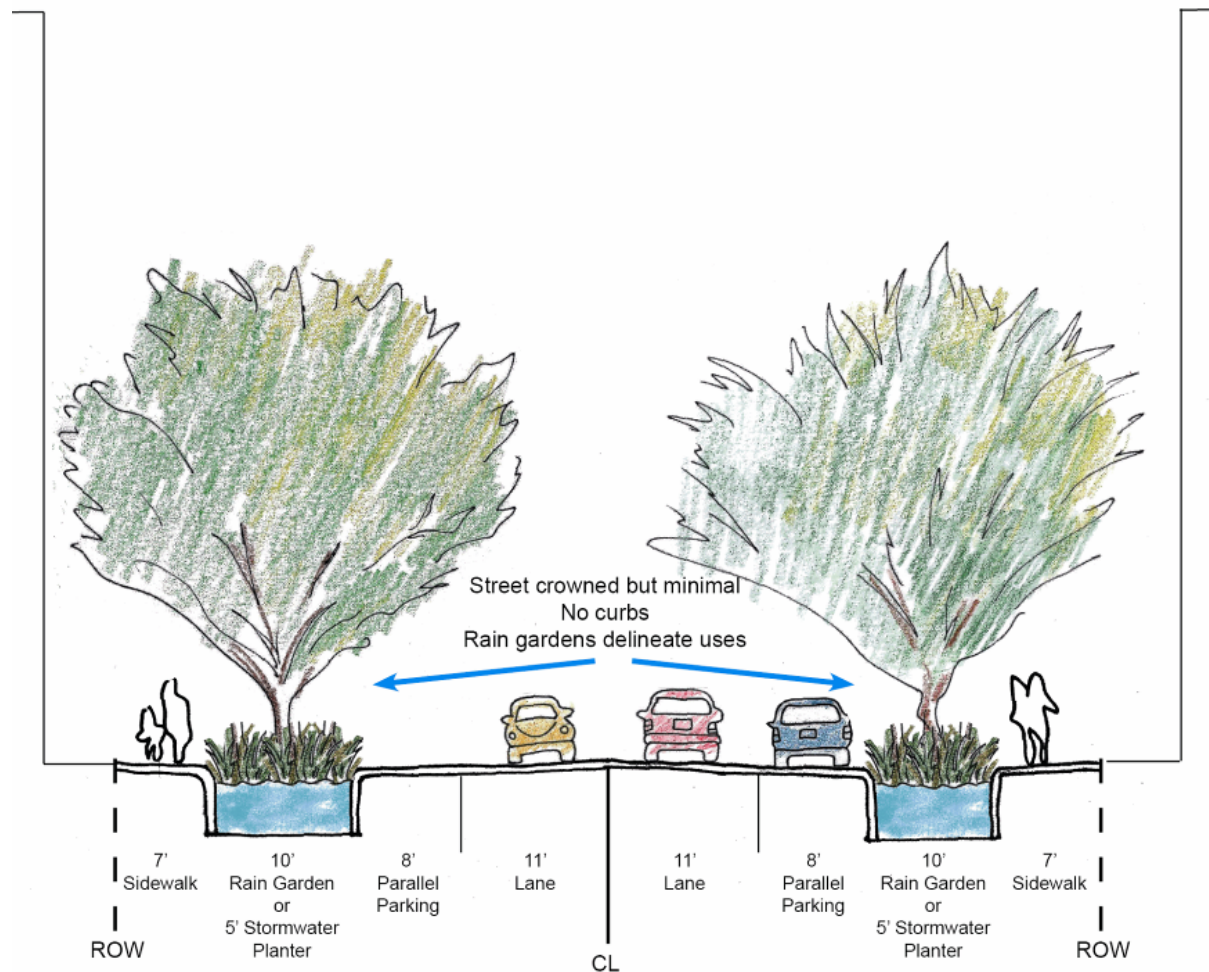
Standard street cross-section, rain gardens or stormwater planters.
